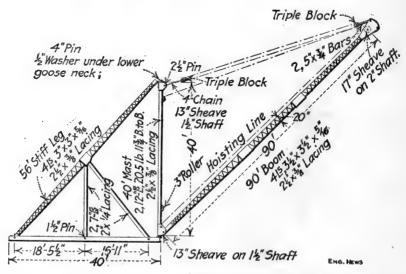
Stiff-Leg Derrick used on Erection Traveler for Erection of Armory, University of Illinois. (Two of these derricks were used on front of traveler.)
